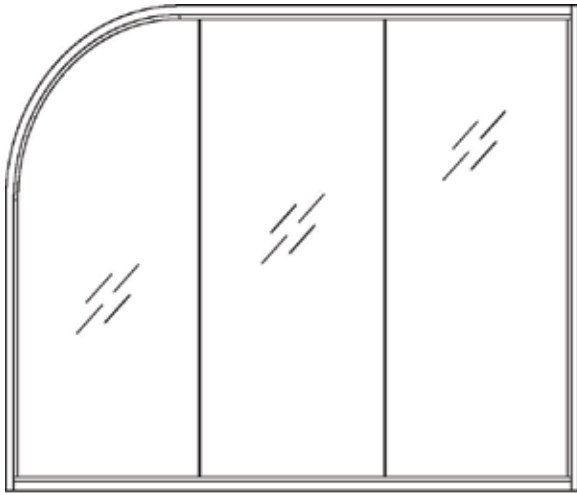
Examples of angle connection of AVL construction -horizontal cross-section through designed wall with doors
